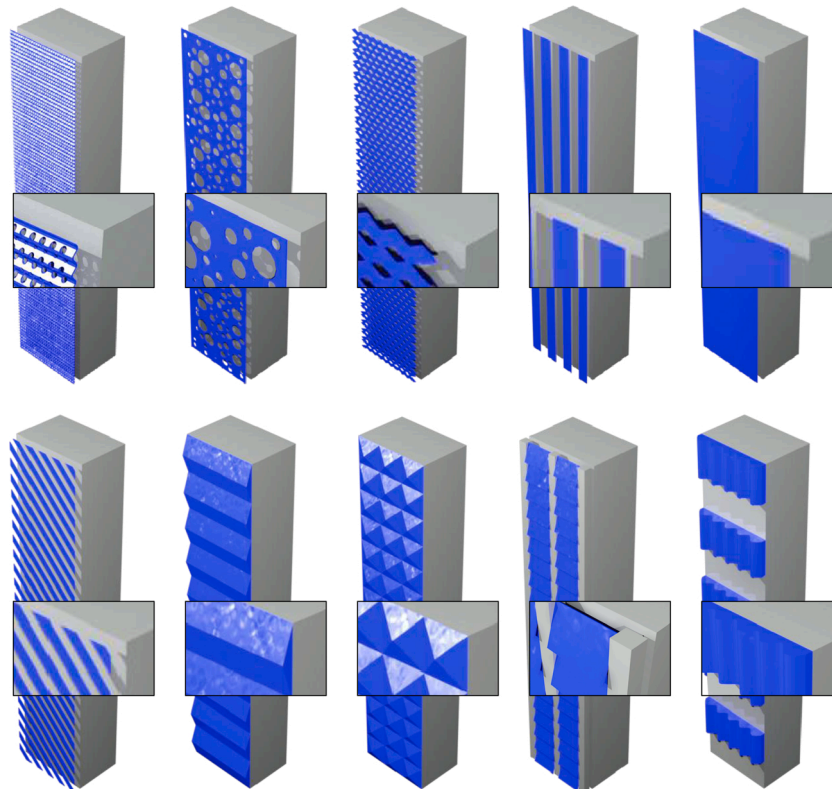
Schematic view of typical double-skin façades installed on tall buildings.
